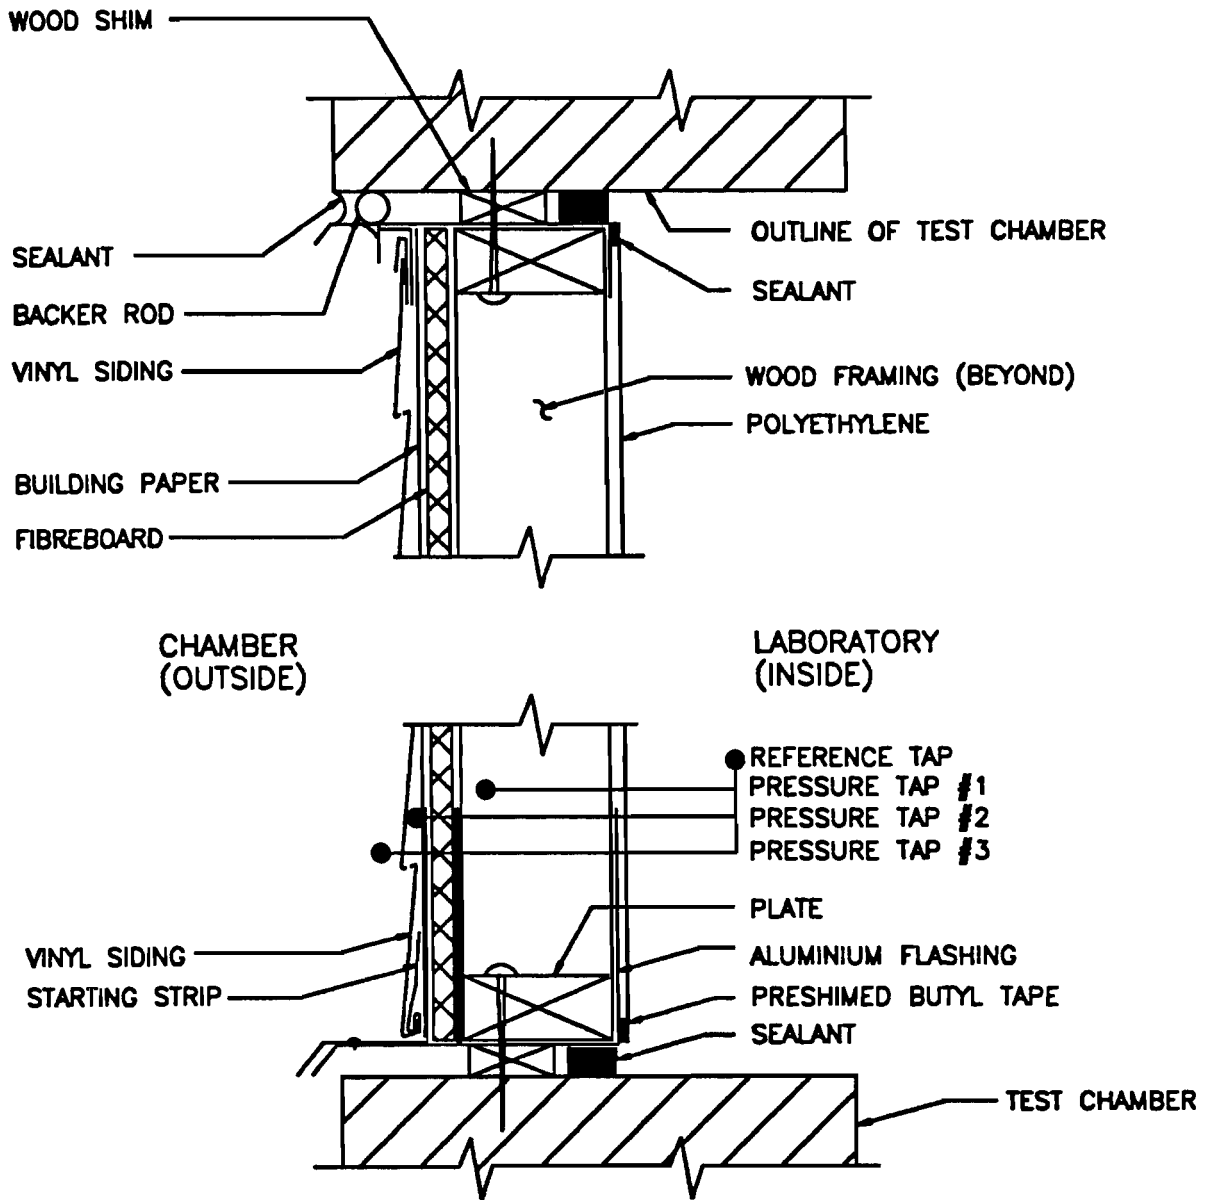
DETAIL OF JUNCTION BETWEEN WALL SAMPLE AND TEST CHAMBER
